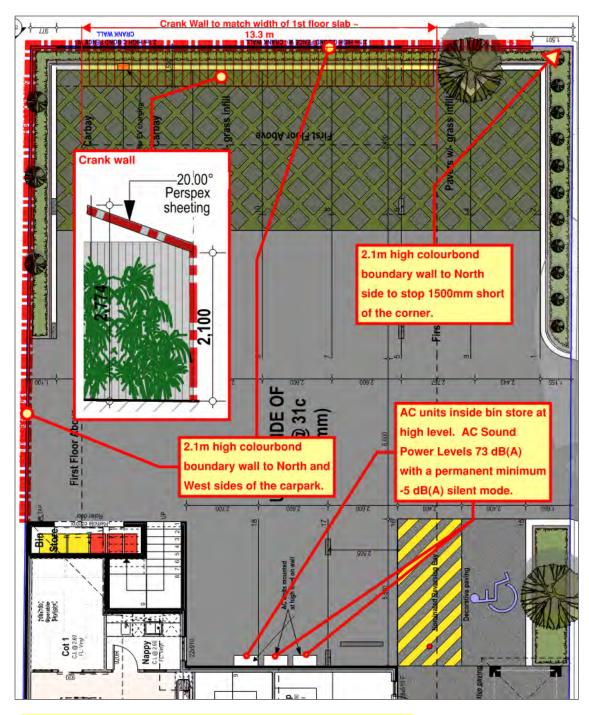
GROUND FLOOR NORTH - Carpark Noise Barriers
